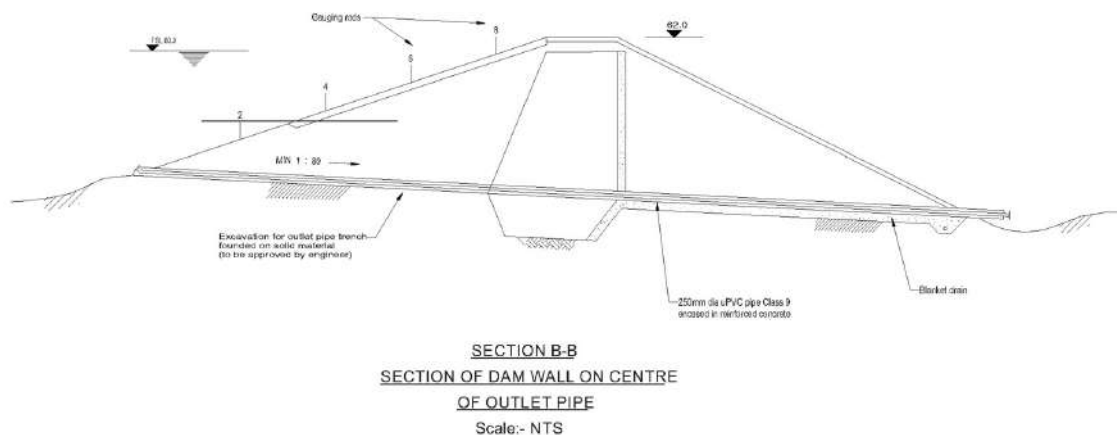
Section of Dam Wall on Centre of Outlet Pipe
